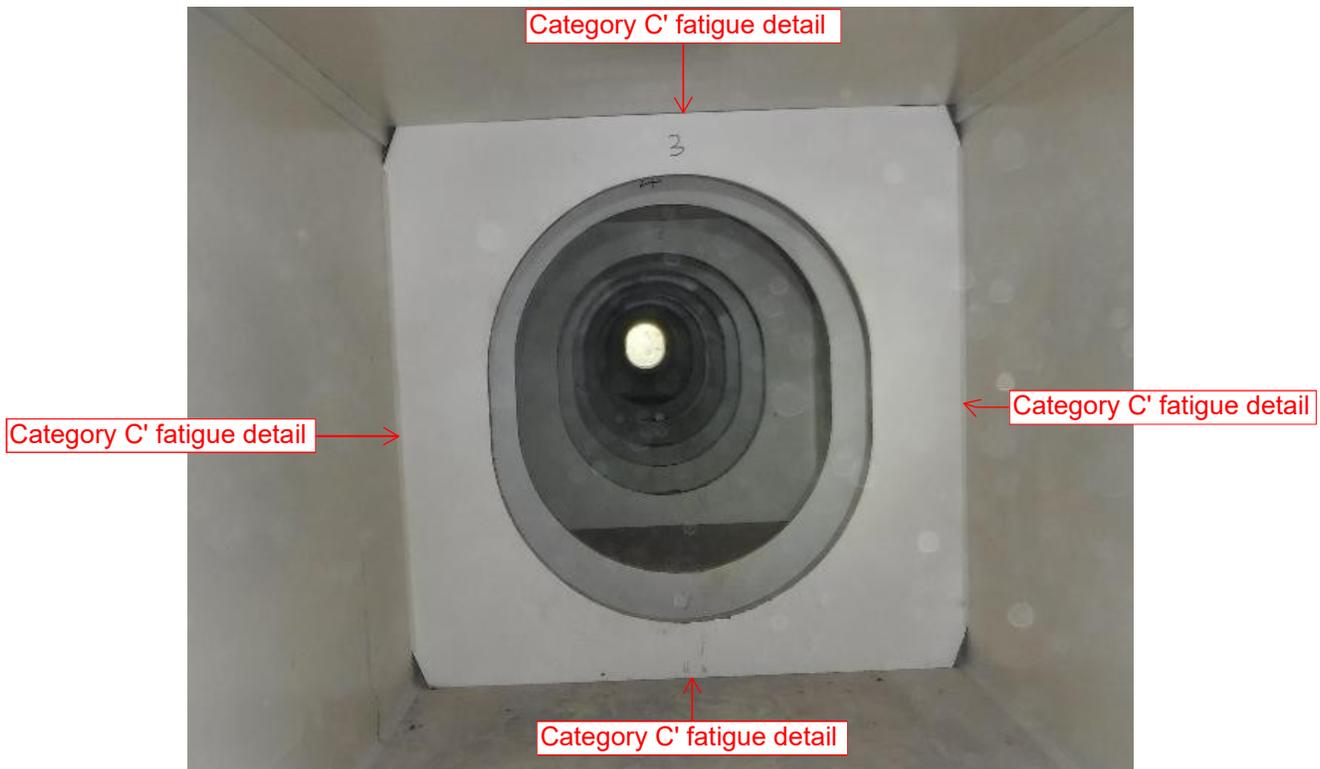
Category C' fatigue detail- Diaphragm fillet welds to webs and flanges
